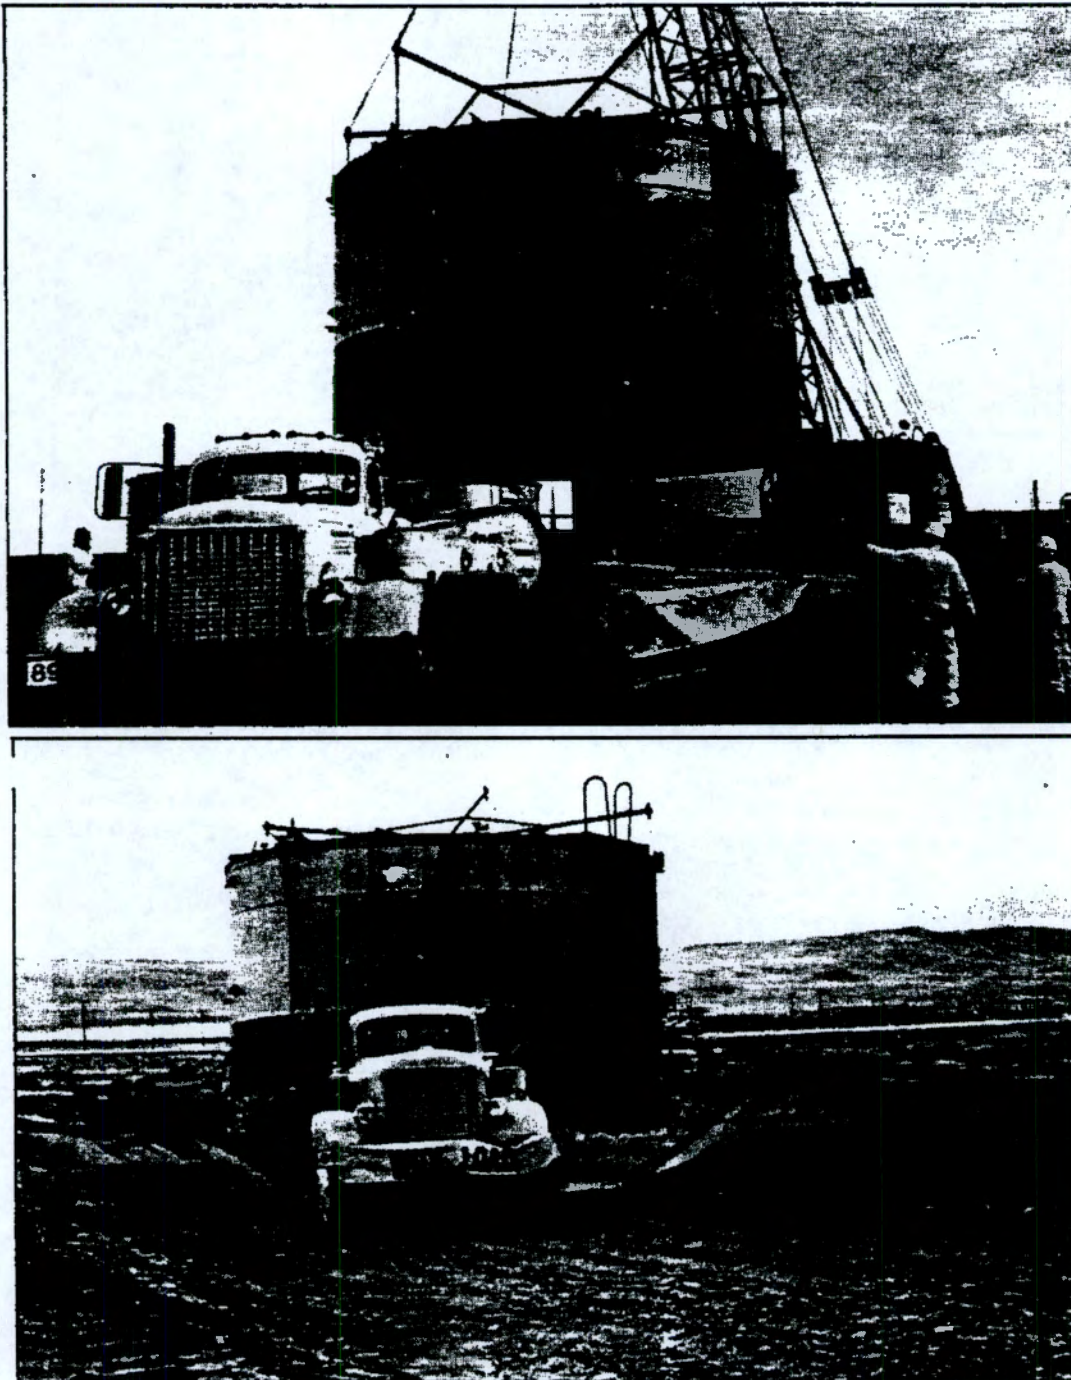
Placing the Tank on the 13-ft Wide, 100-Ton Capacity Trailer (top), and Driving Slowly on the Specially Built Haul Road Across the Redox Railroad Cut (bottom).
